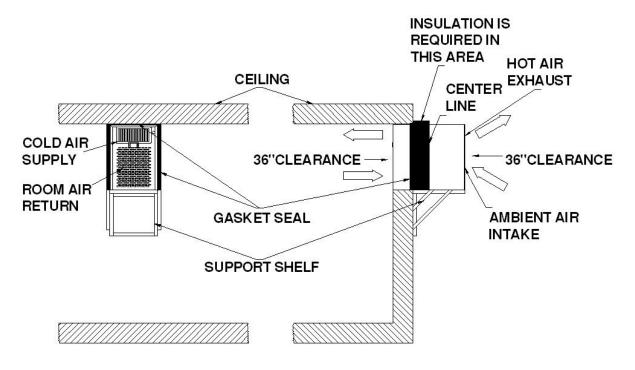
THROUGH-WALL INSTALLATION (INSIDE WALL FLUSH)
